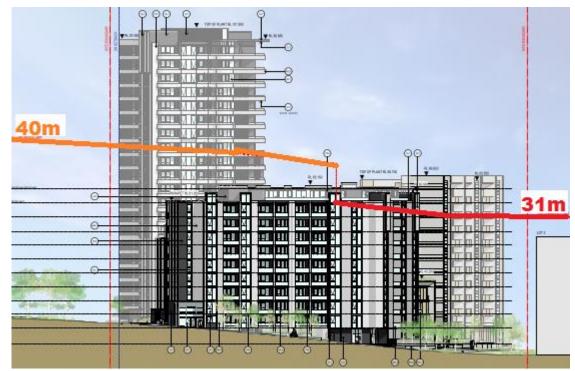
Extract of sectional drawing when viewed from the Eastern Elevation
